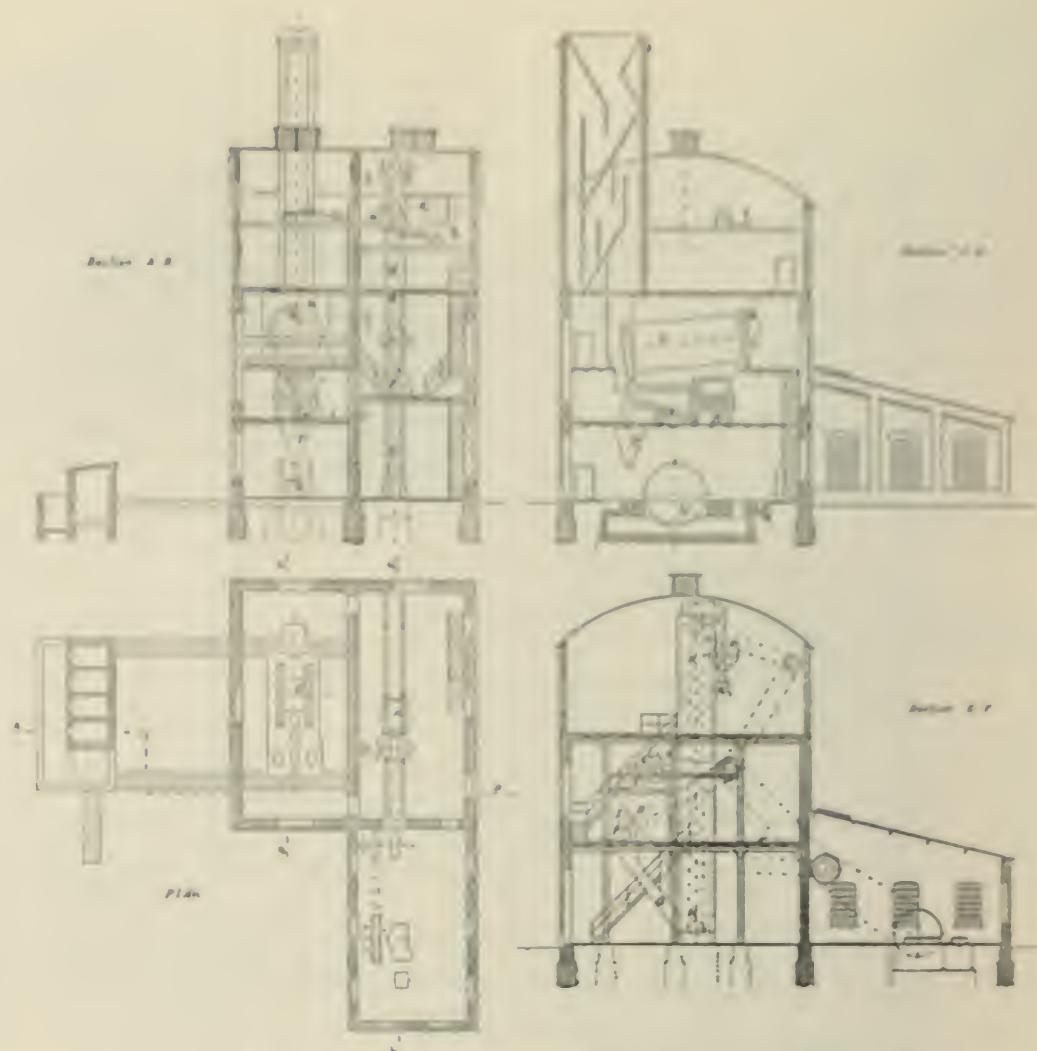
Peat Briquetting Plant with One Press and Schulz Drier.
